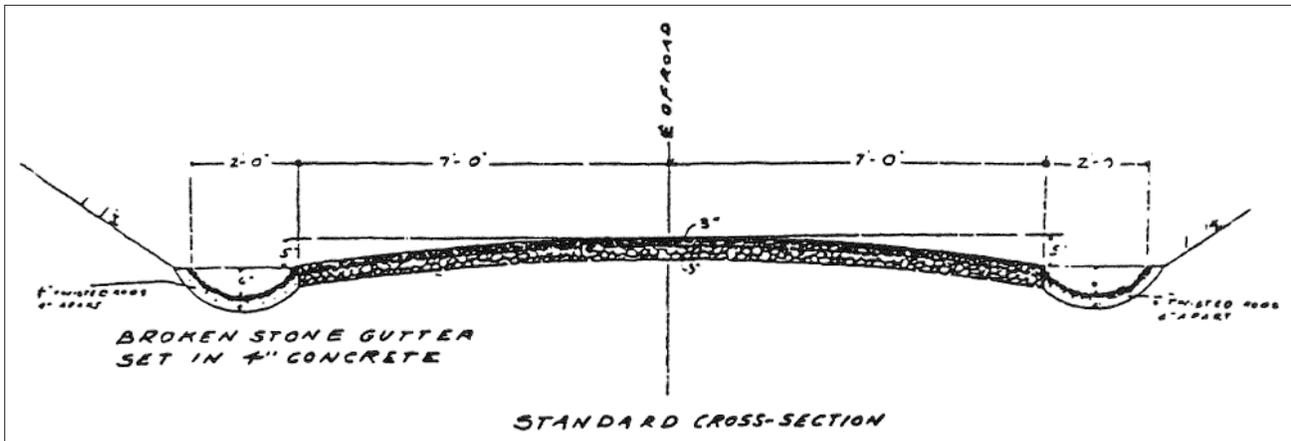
Macadam Road Cross Section. The section was redrawn from a 1911 original prepared by Hans Rude Jacobsen for Roosevelt's new Macadam Road. The finish grades of any future surfacing should match the historic crown of the Macadam Road and should not extend into or cover the historic concrete gutters on either side (Bellavia and Curry, *Cultural Landscape Report*, 54).
